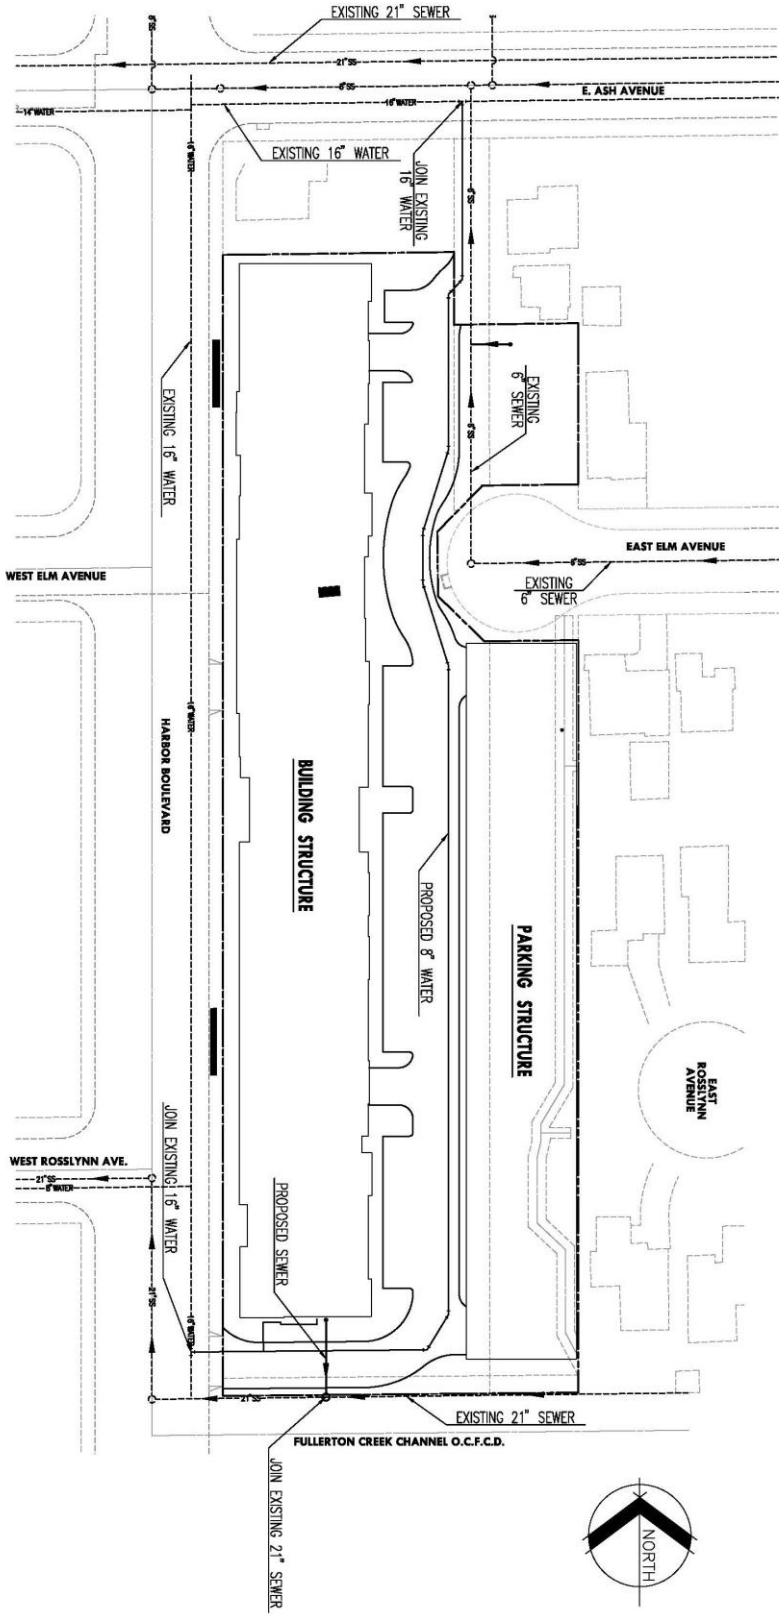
CONCEPTUAL WATER AND WASTEWATER PLAN
